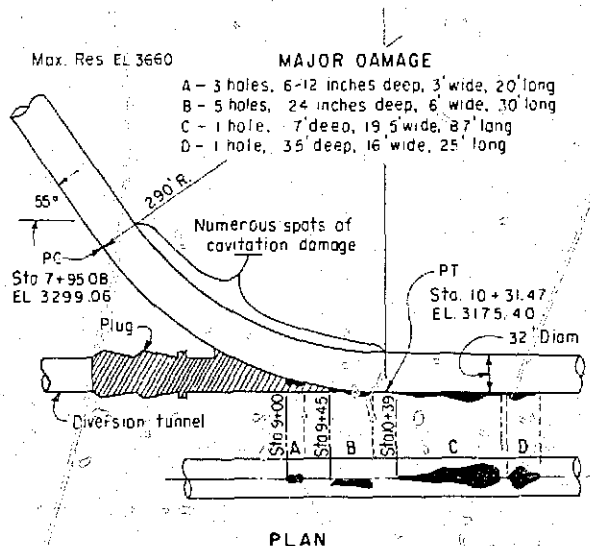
Yellowtail Dam—Section through tunnel spillway bend—Location of major damaged areas, 1967 flood releases.
